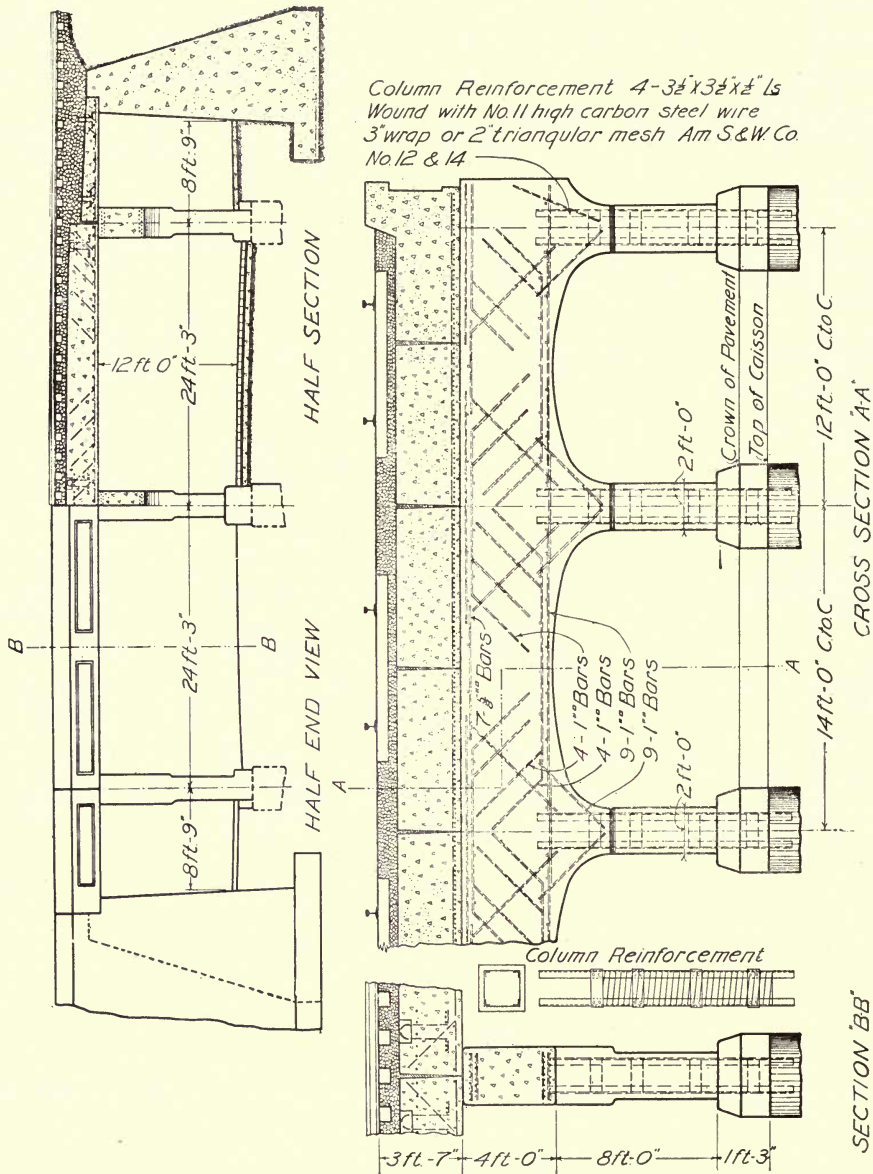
TYPICAL DETAILS, C, B & Q. R. R. TRACK ELEVATION.
